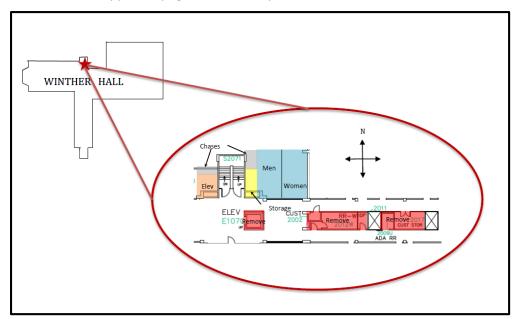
Zoomed-in View of Expanded Restrooms Floor Plan
